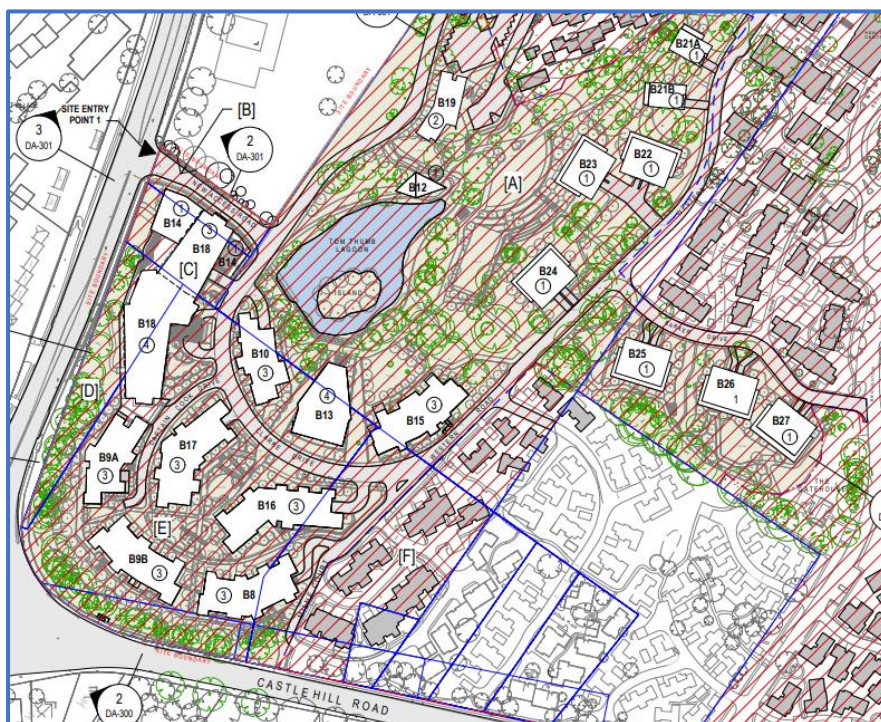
Site Plan – Deemed Refusal Plans lodged with the Court in October 2019
